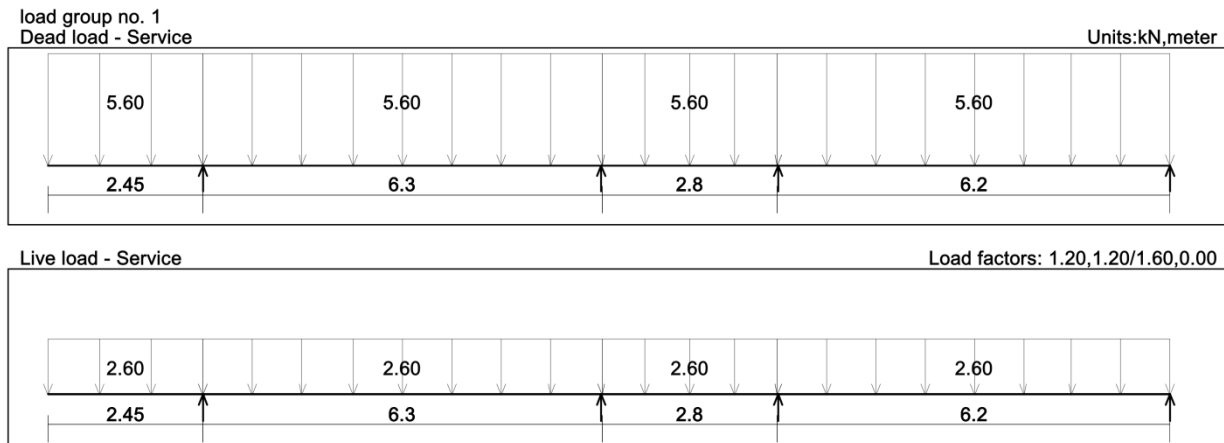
Statically System and Loads Distribution of Rib (R13).
